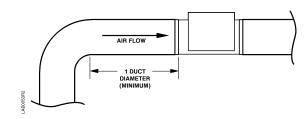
Exhaust Terminal Properly Installed after an Elbow Duct Section.
